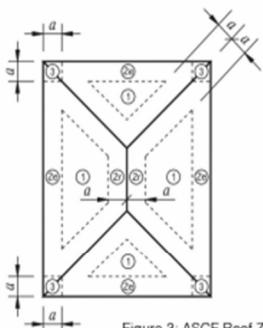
ASCE Roof Zone Locations for Hip Roofs
